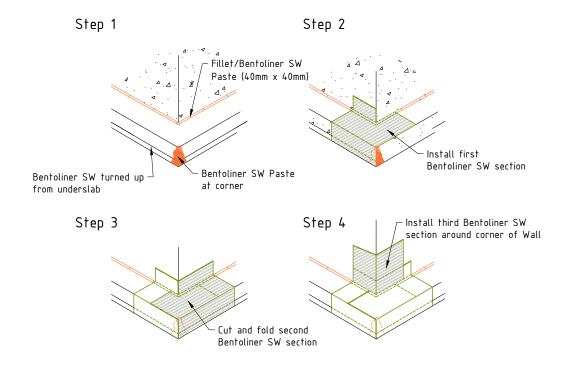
Step by step detail of outside wall base corner installation (hydrostatic condition)
